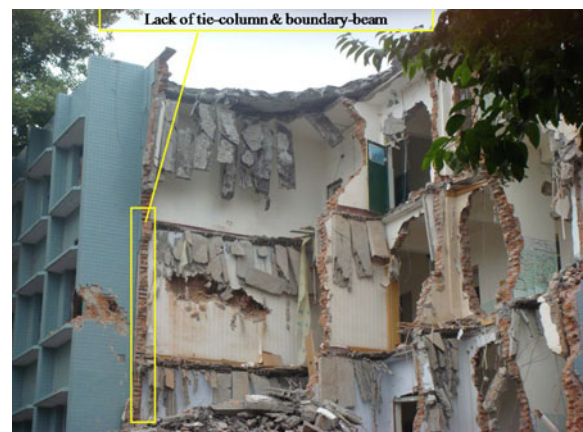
Partially collapsed masonry structure due to lack of required tie-column and boundary-beam (0.1g/0.3g)
